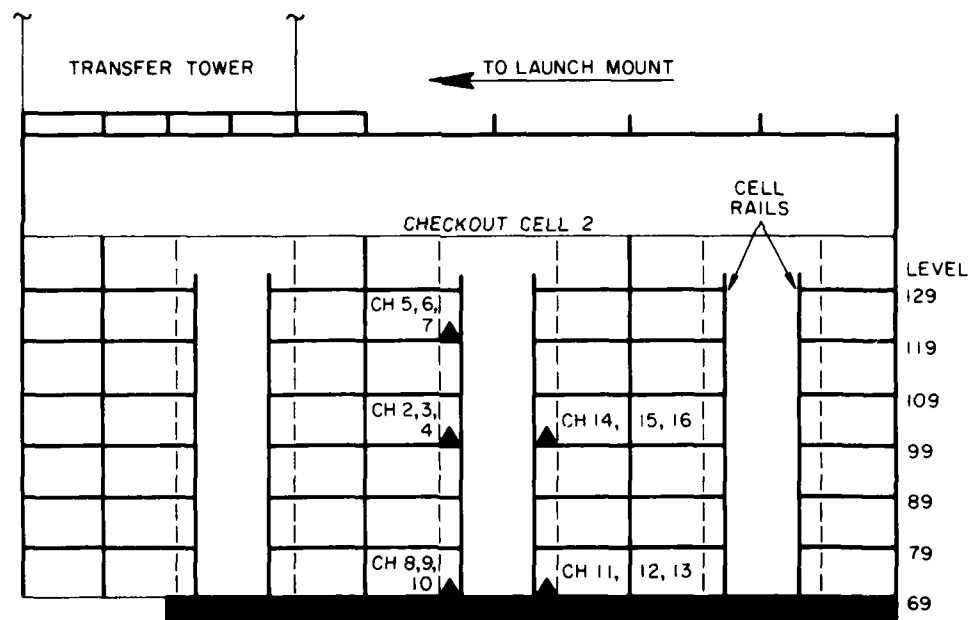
Cross-Sectional View of the PPR Showing Sensor Locations
